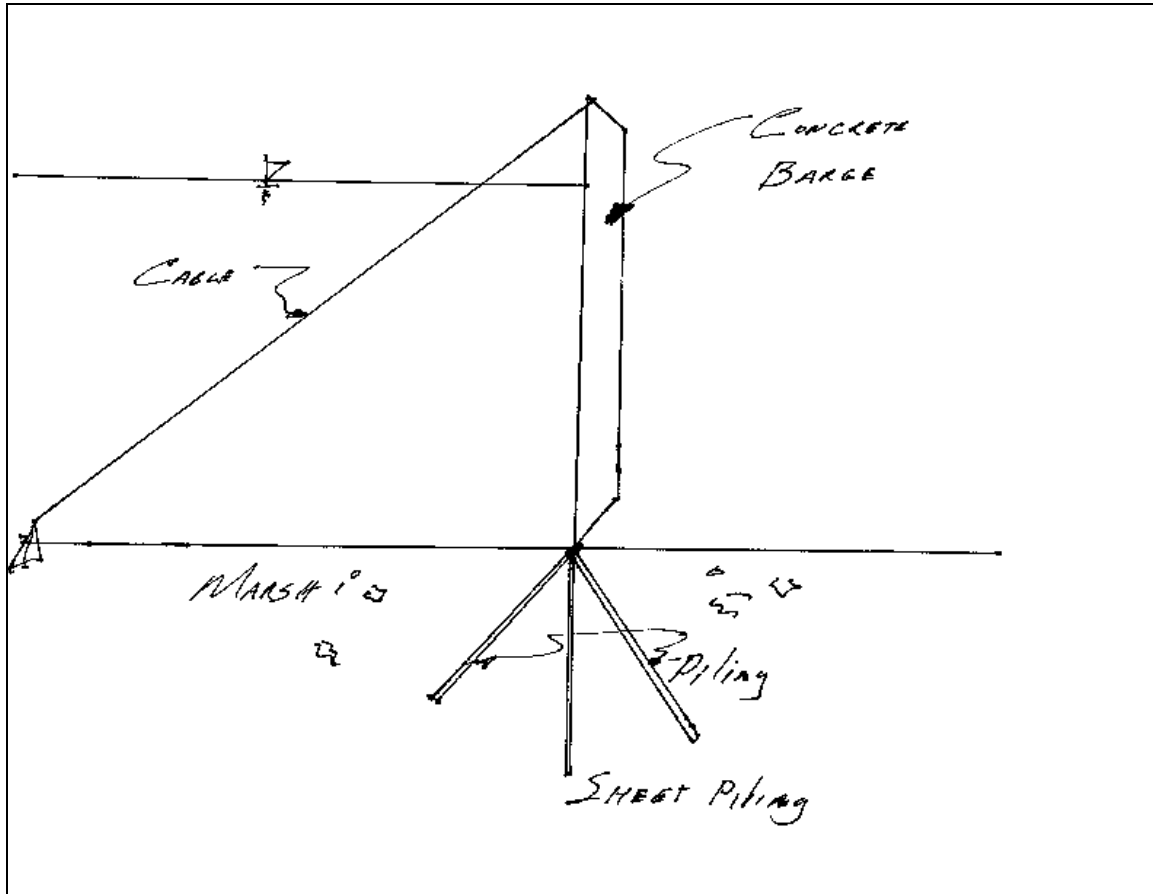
Self-raising wall section showing foundation piles and anchorage.
